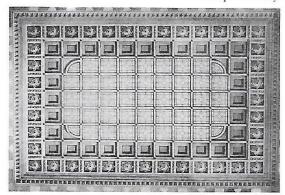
Plan of ceiling dated March 28, 1856. The visible ceiling was of cast iron elements cast in New York and stained glass from Philadelphia. Drawing dated March 28, 1856.
